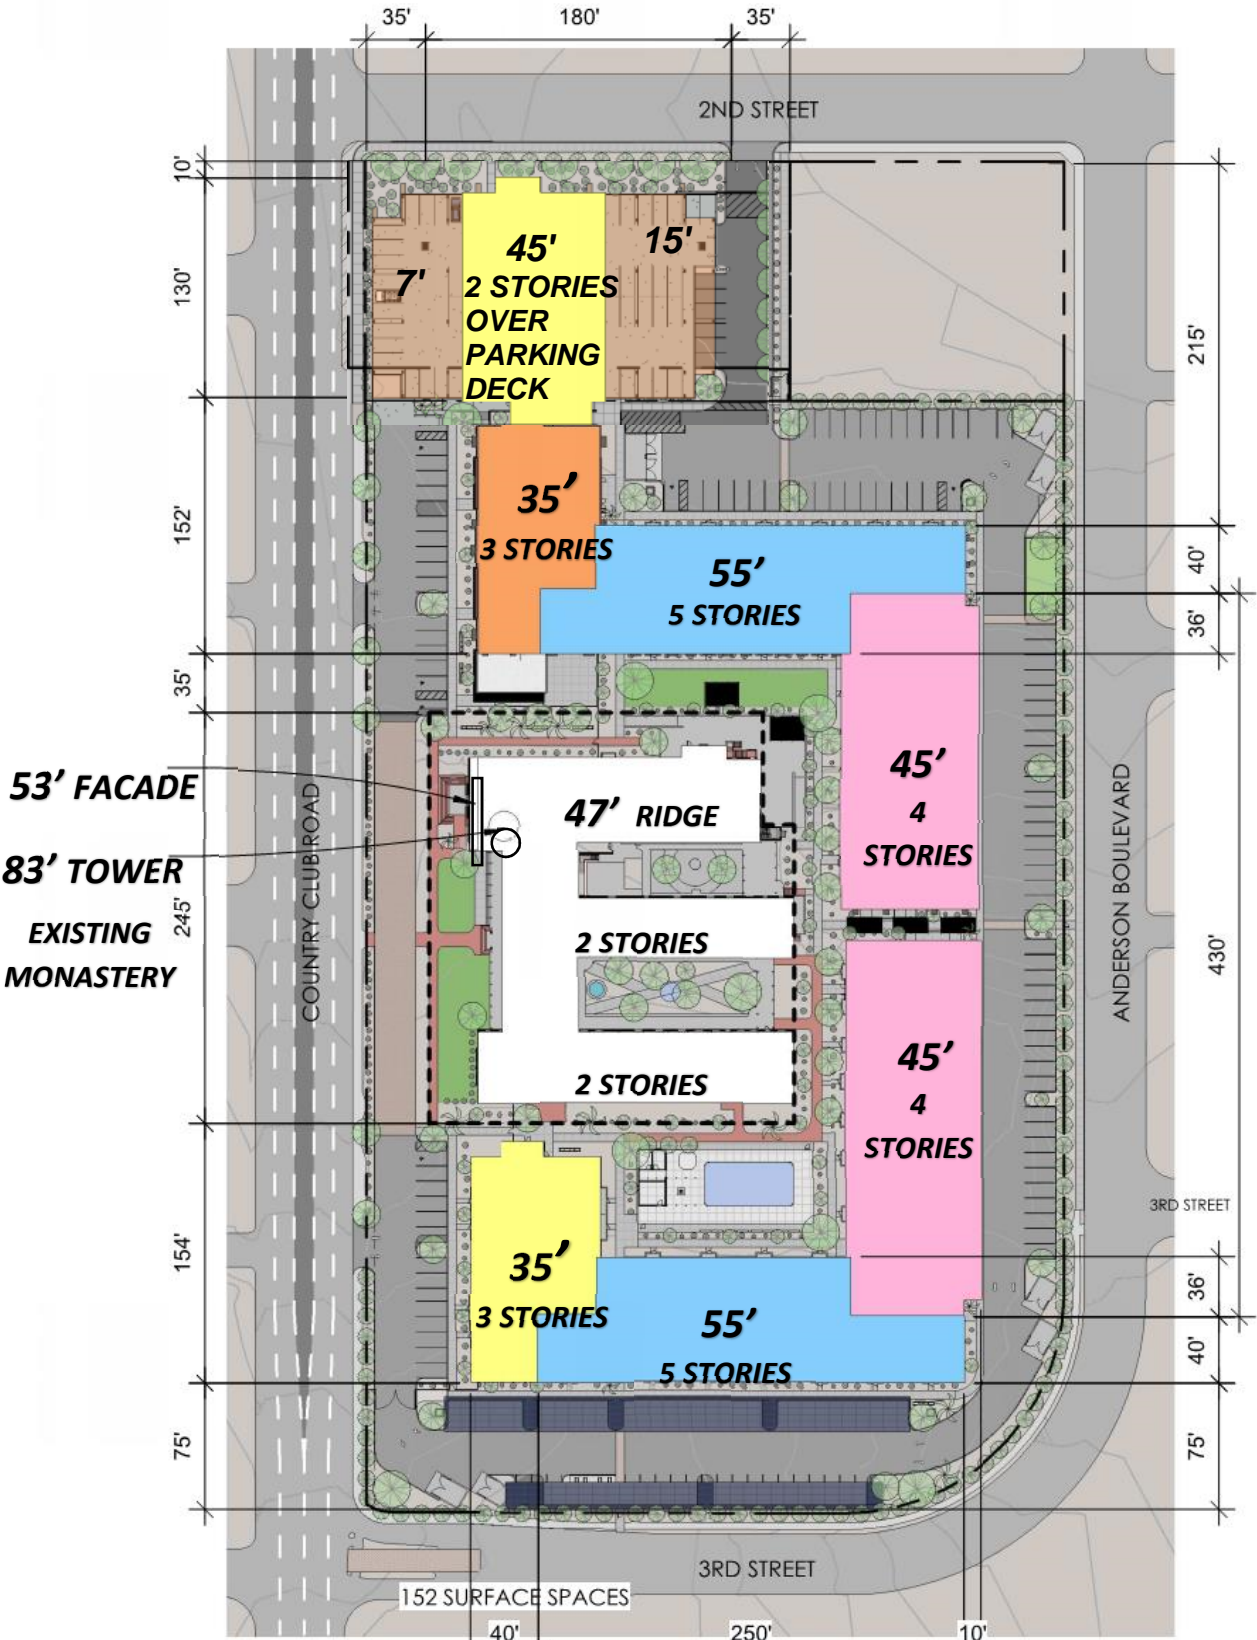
C PROPOSED NEW CONSTRUCTION MAXIMUM BUILDING HEIGHT
